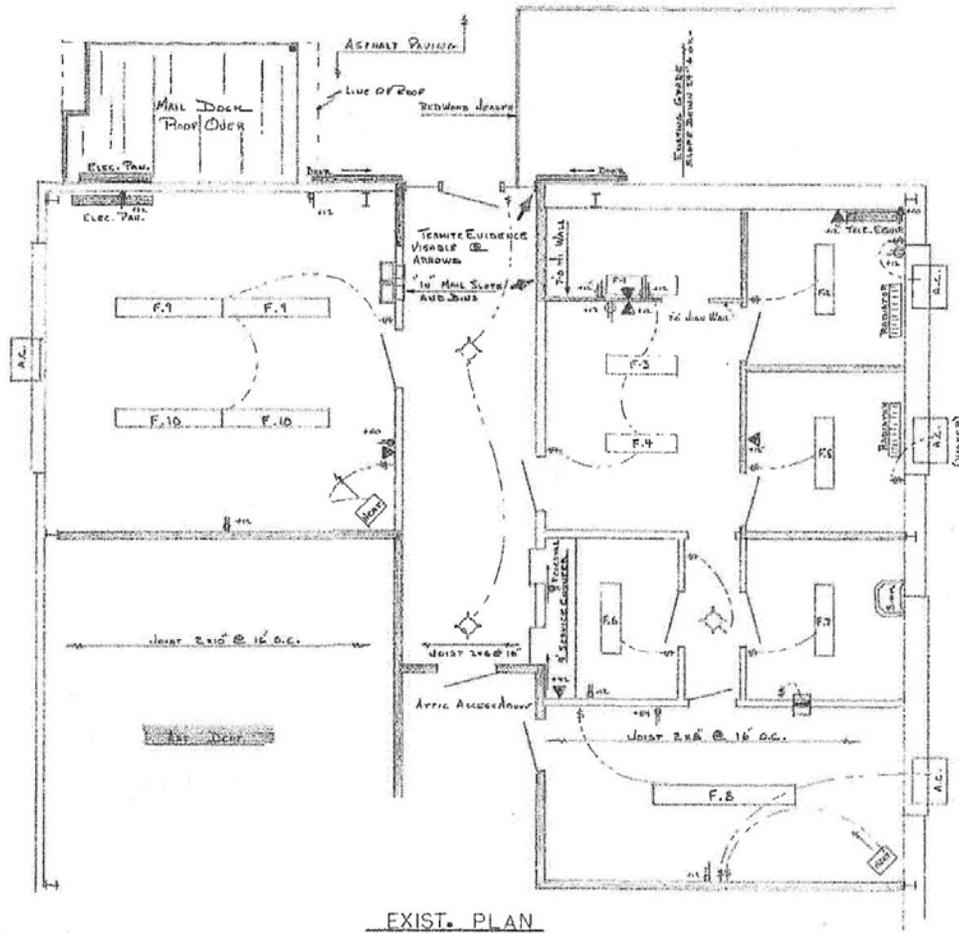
Floor plan of police station (right) and mailroom (left), May 1967. Courtesy of Planning, Facilities and Safety, UC Davis.
